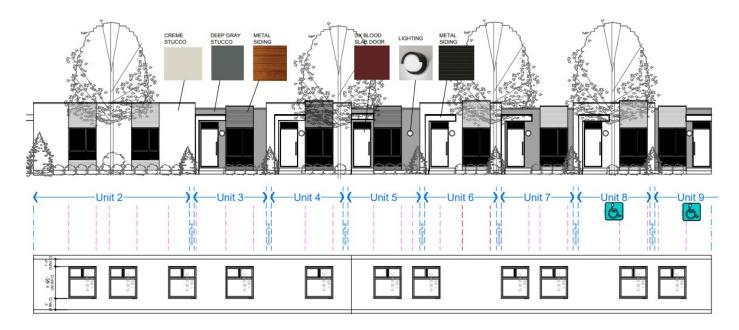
Partial Front (South) Building Façade with Materials - Proposed & Existing
